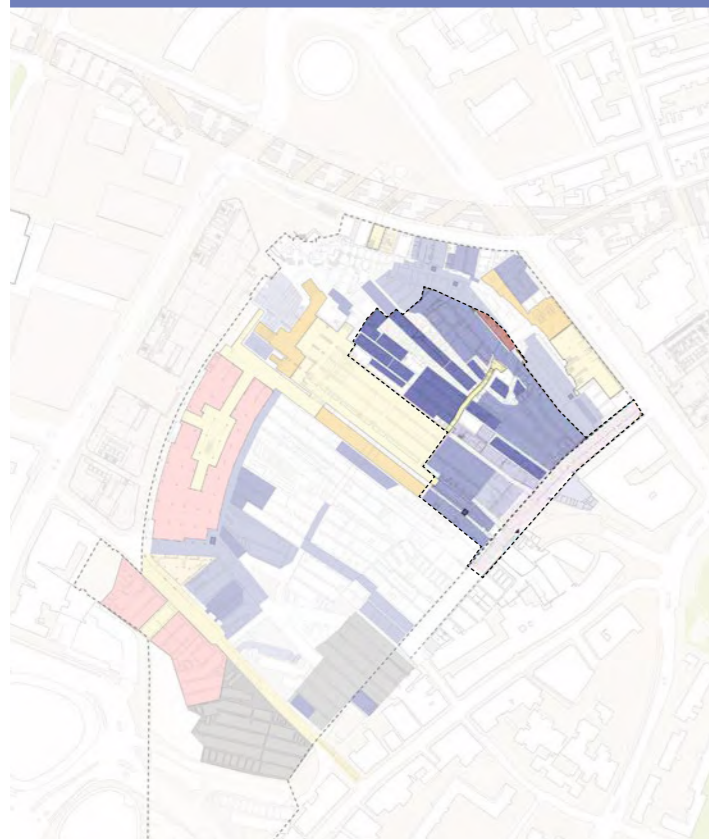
Grade / Undercrofts Level Sketch Plan
